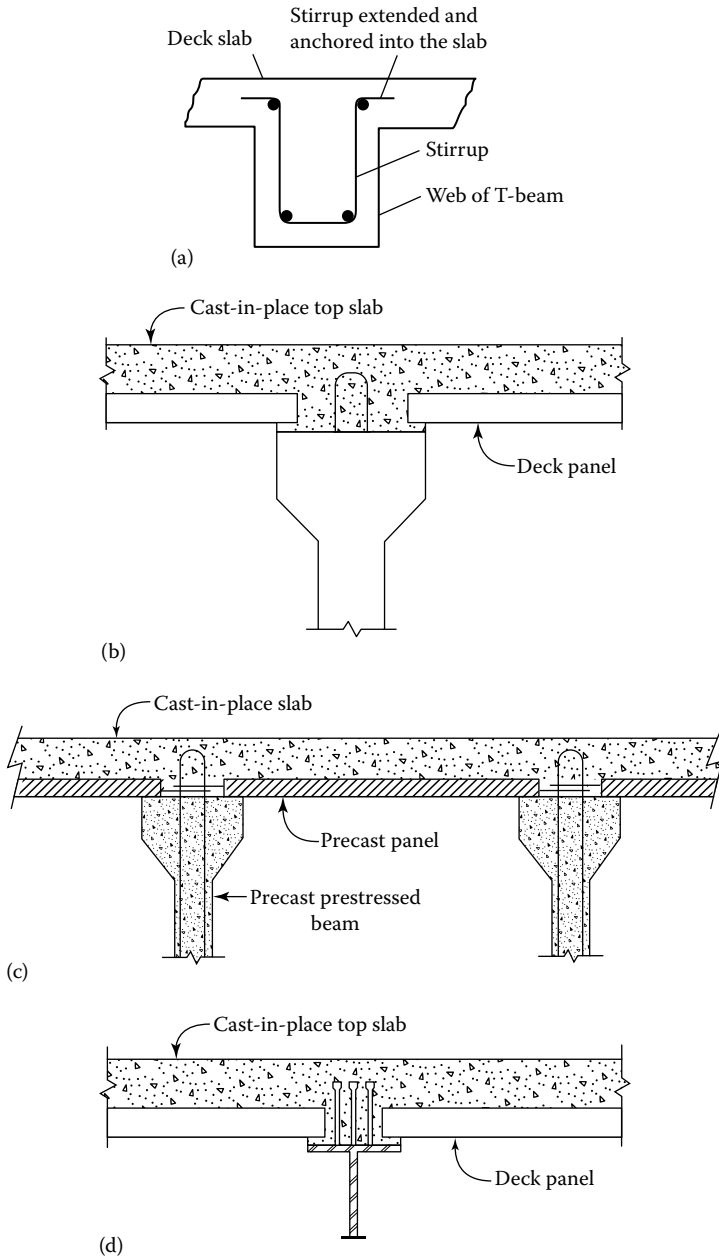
Methods of creating composite action between decks and supporting beams. (a) T-beam stirrups extending from the web and anchored in the deck, (b and c) hooks protruding from the top of precast, prestressed concrete girders and embedded in the deck, (d) shear studs welded to the top flange of steel girder and embedded into the deck.
